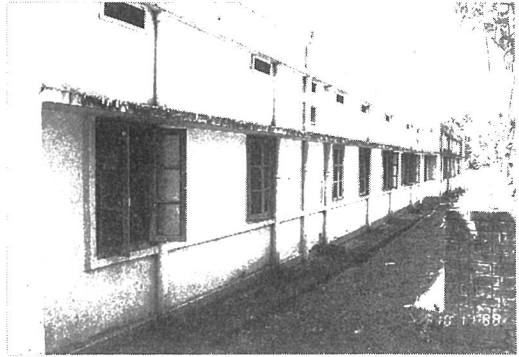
An undamaged reinforced concrete ward at Dharan Hospital, Dharan Bazaar, Nepal
